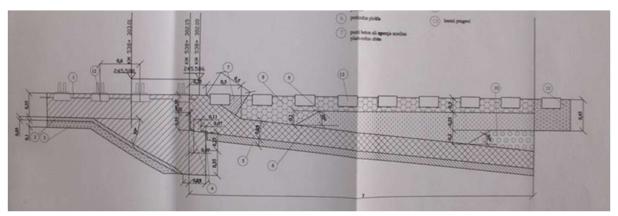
Transition zone from slab track in tunnel to gravel embankment
